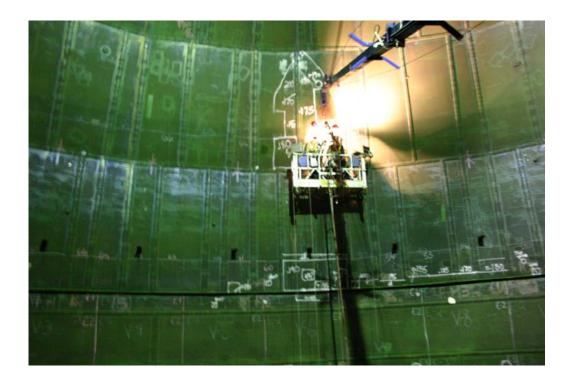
NDE technician/examiner performing angle beam UT measurements/examination of the intersection of the lower dome plates and the bottom plates.
